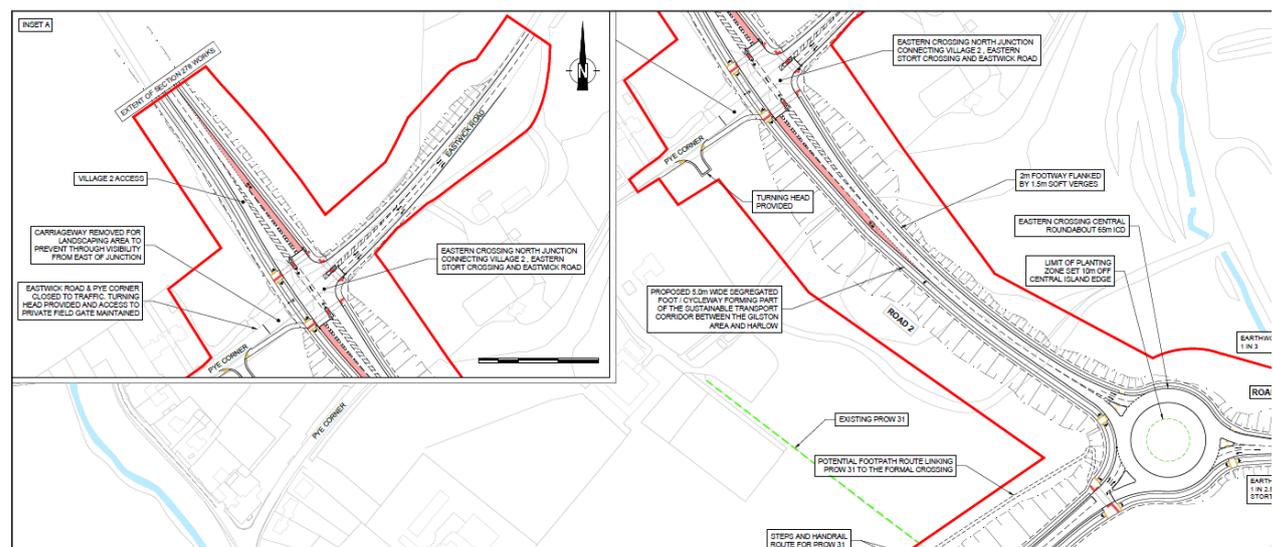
Interim Village 2 Access Extract of VD17516/V2i-100-GA
